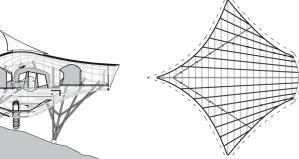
Longitudinal section Figure 4.1g: Plan
